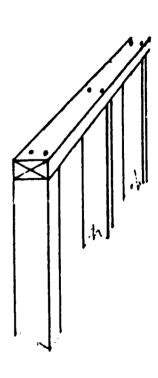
Design of wall top plate for Fig. 18 - Standard top plate wind area. Note horizontal nails vertical nailing
